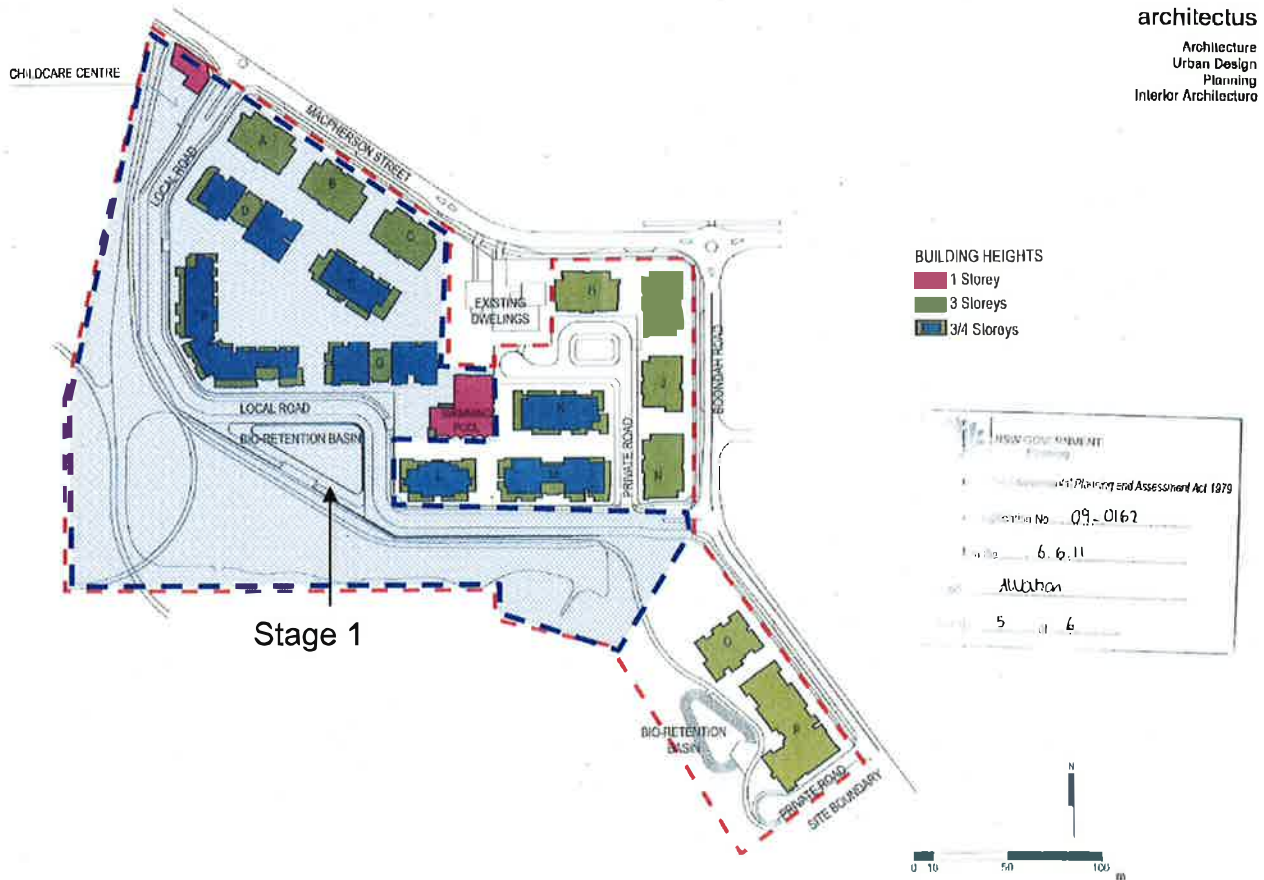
The revised Project Layout approved by the Director-General in accordance with modification requirement 2 of the PAC Concept Plan Approval and Condition B1 of the Project Approval.
